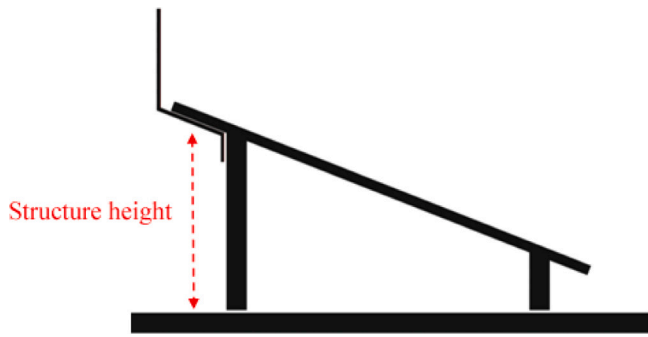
Structure and installed passive LPS side view in the study PV power plant.
